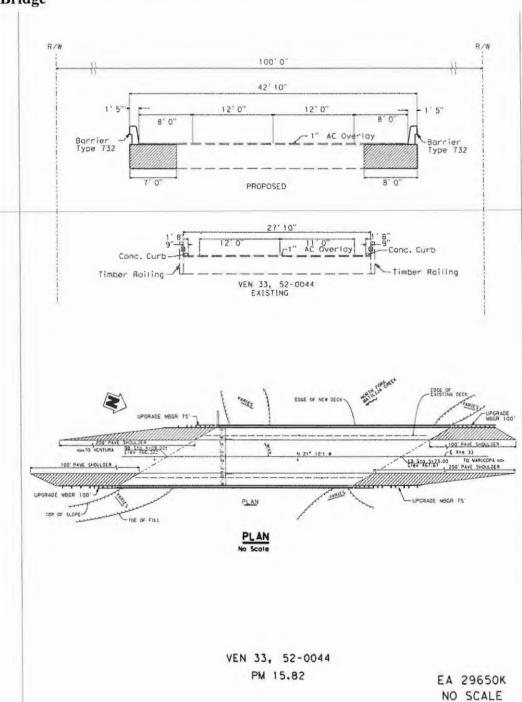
Design Concept proposed for Location 2 - Route 33 (PM) 15.82 at Matilija Bridge
